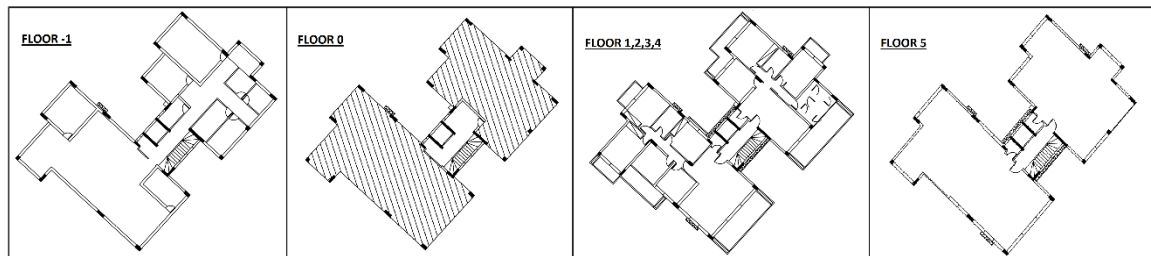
Floor plans of the underground floor, the ground floor, first, second, third and fourth (identical) floors and fifth floor of Building 1, at the scale of 1:200 (Source: Andritsou et al., 2022).
